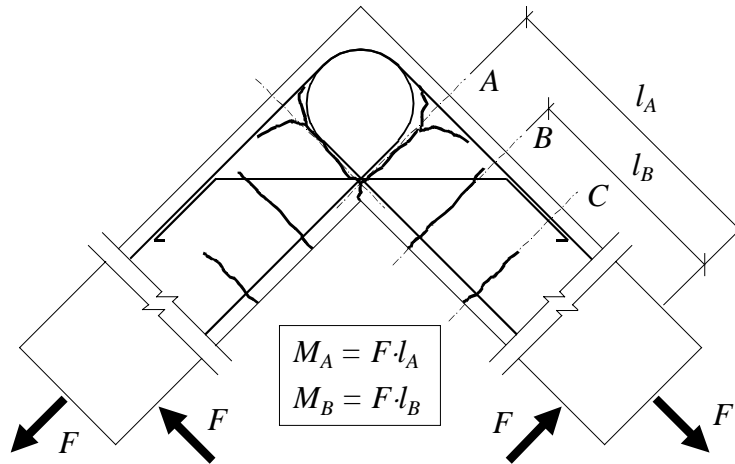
Schematic view of potential critical crack sections in an opening corner.
